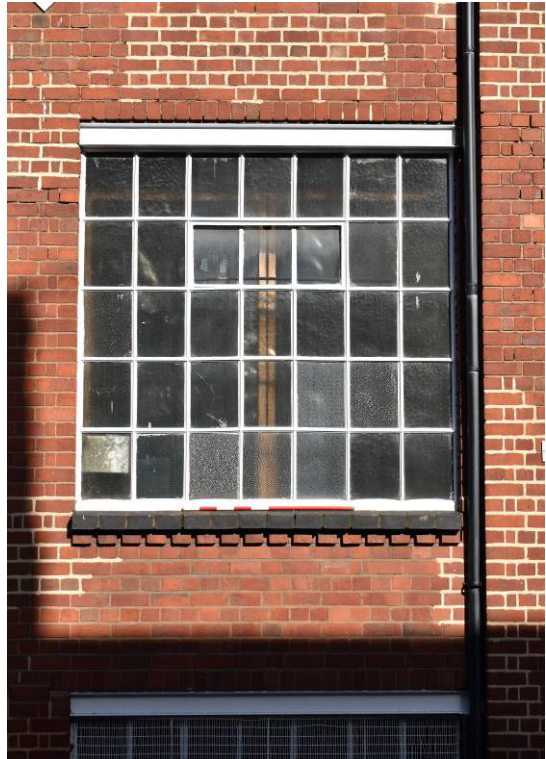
Block B, Brook Street frontage; ground-floor multi-pane window (Bay 5).
